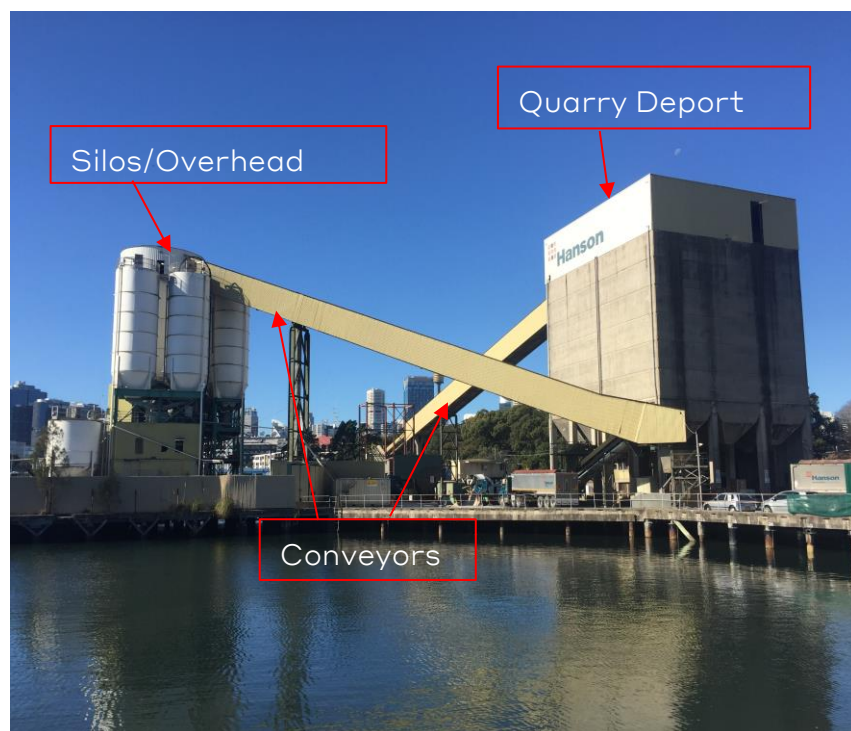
View of the existing concrete batching plant, looking south east from the marina near the Boathouse
